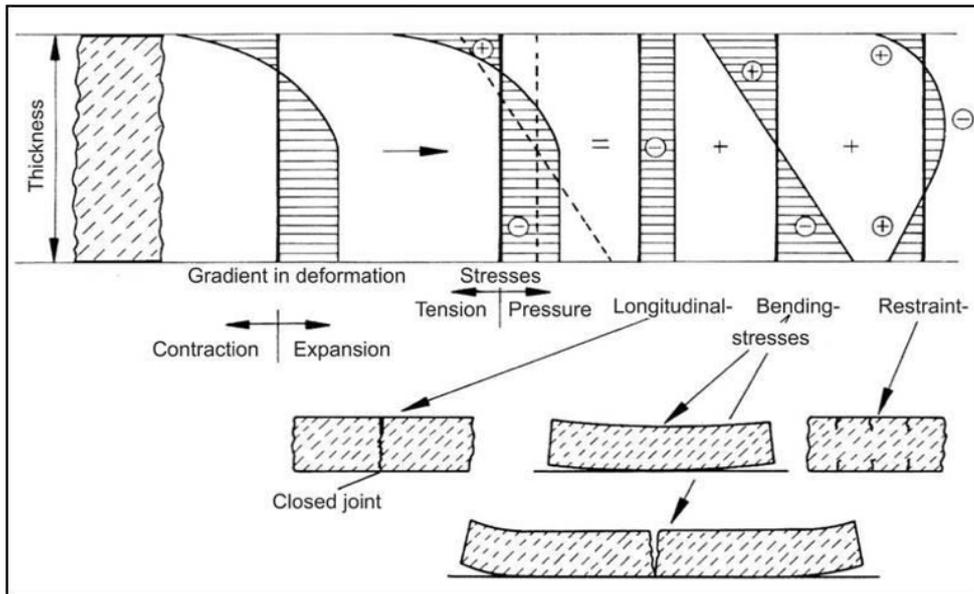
Stresses and cracks in concrete pavements due to negative gradients of deformation [7].
